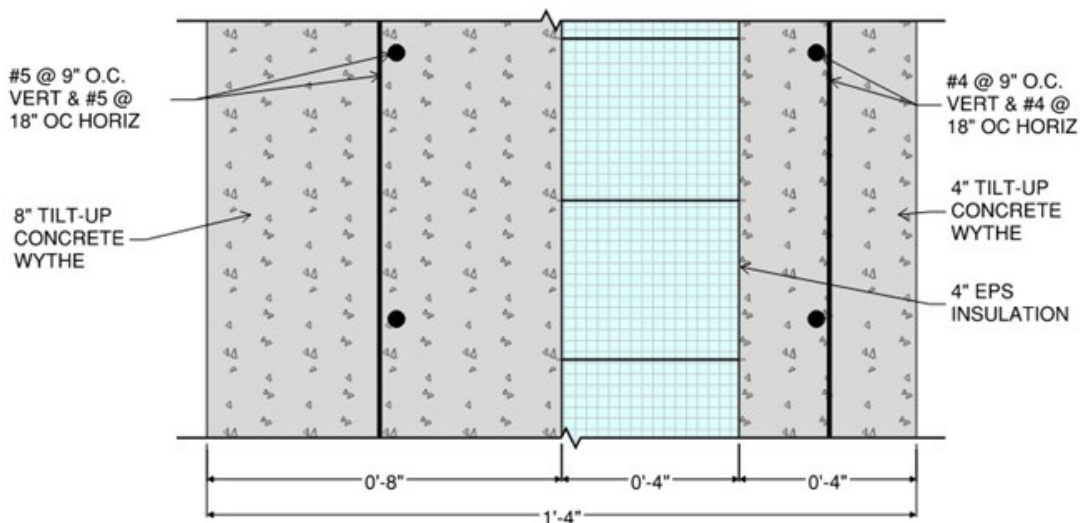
Structural cast-in-place tilt-up concrete wall assembly section detail
